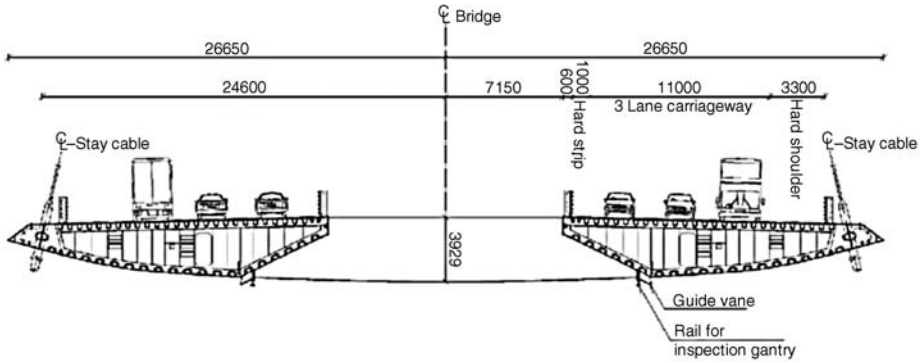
Guide vanes installed in the Stonecutters cable-stayed bridge.
